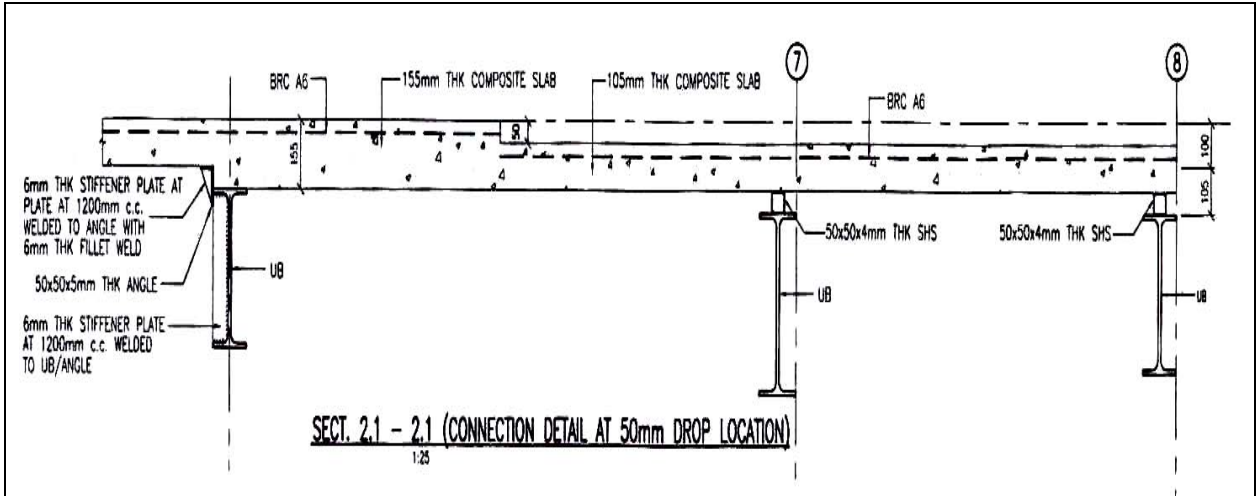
Connection details for 50mm drop in slab (details and sizes shown are indicative only)
